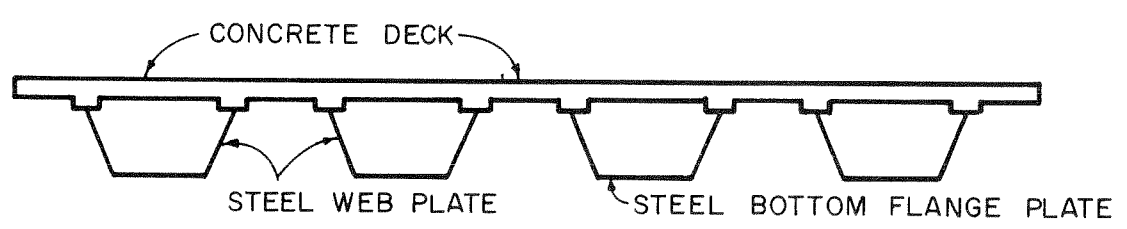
CROSS-SECTION OF A COMPOSITE STEEL-CONCRETE BOX GIRDER BRIDGE
